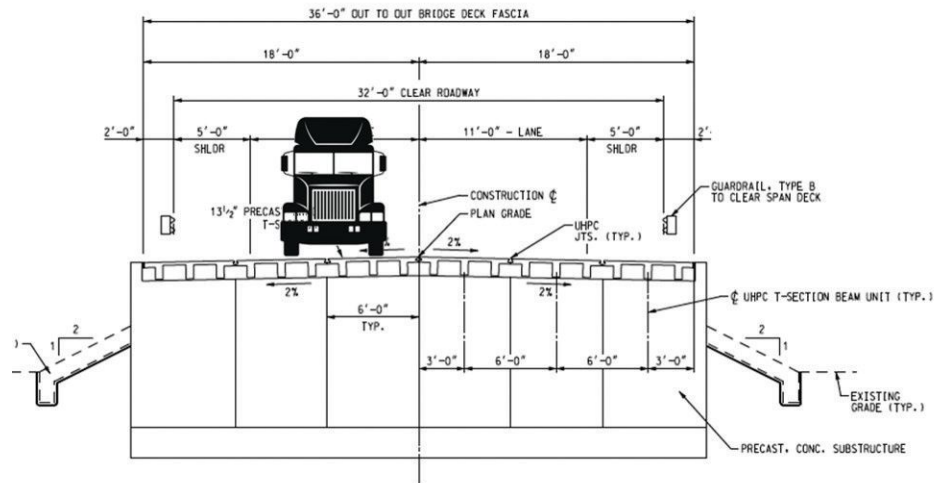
Bridge cross section. All Photos and Figures: HiPer Fiber LLC/St. Clair County Road Commission.
